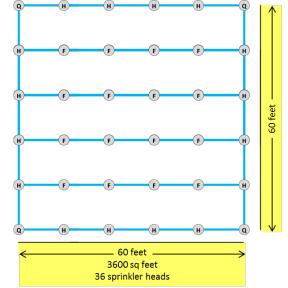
Head-to-Head Sprinkler Layout for Typical Turf Yard
